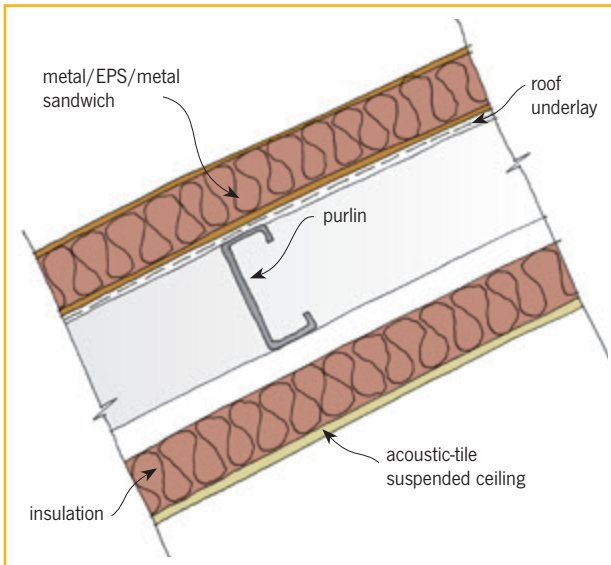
Roof specimen 4: A metal roofing/EPS polystyrene/metal SIP panel installed over the purlins and roof underlay. The roof panel is the weathertight building cladding.
